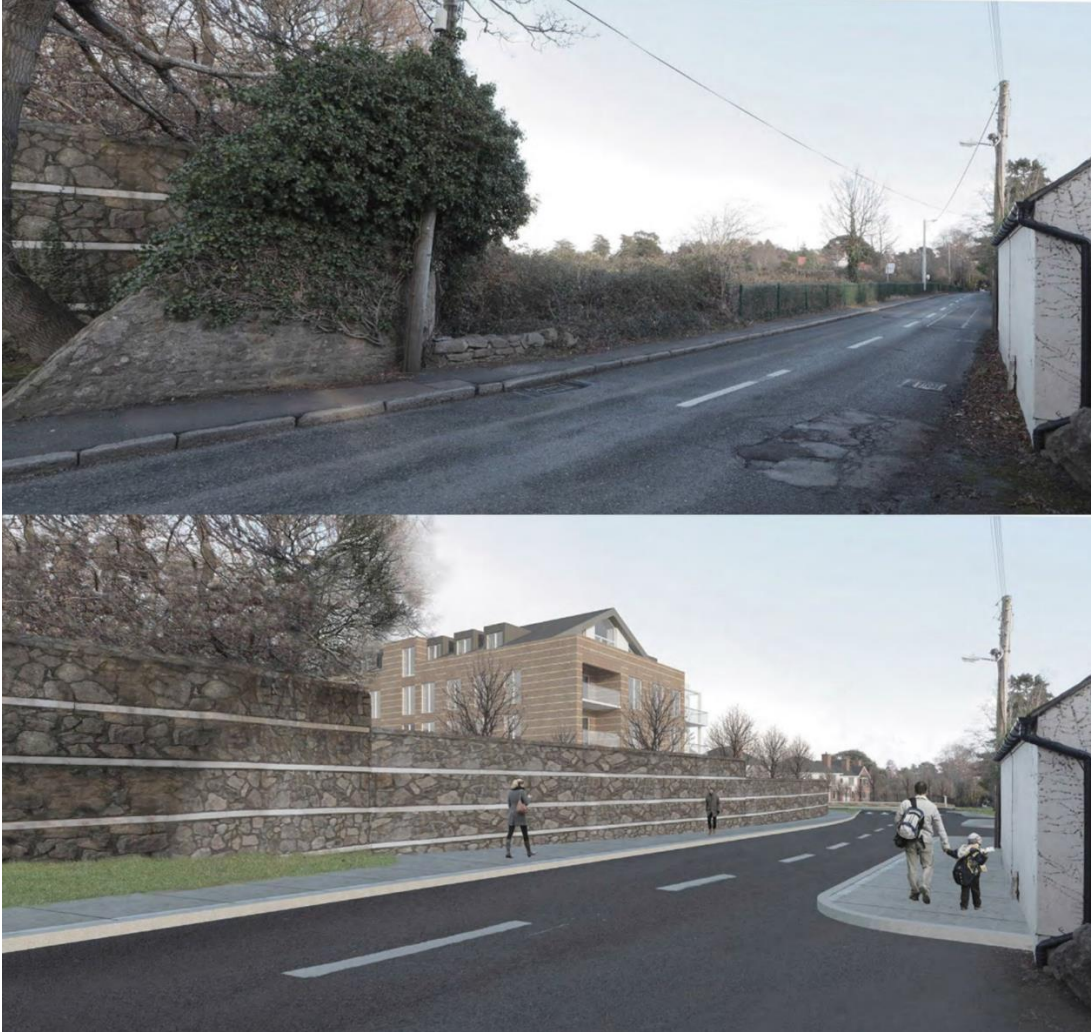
Existing upgrade to Brennanstown Road as part of planning application ABP-301614-18
